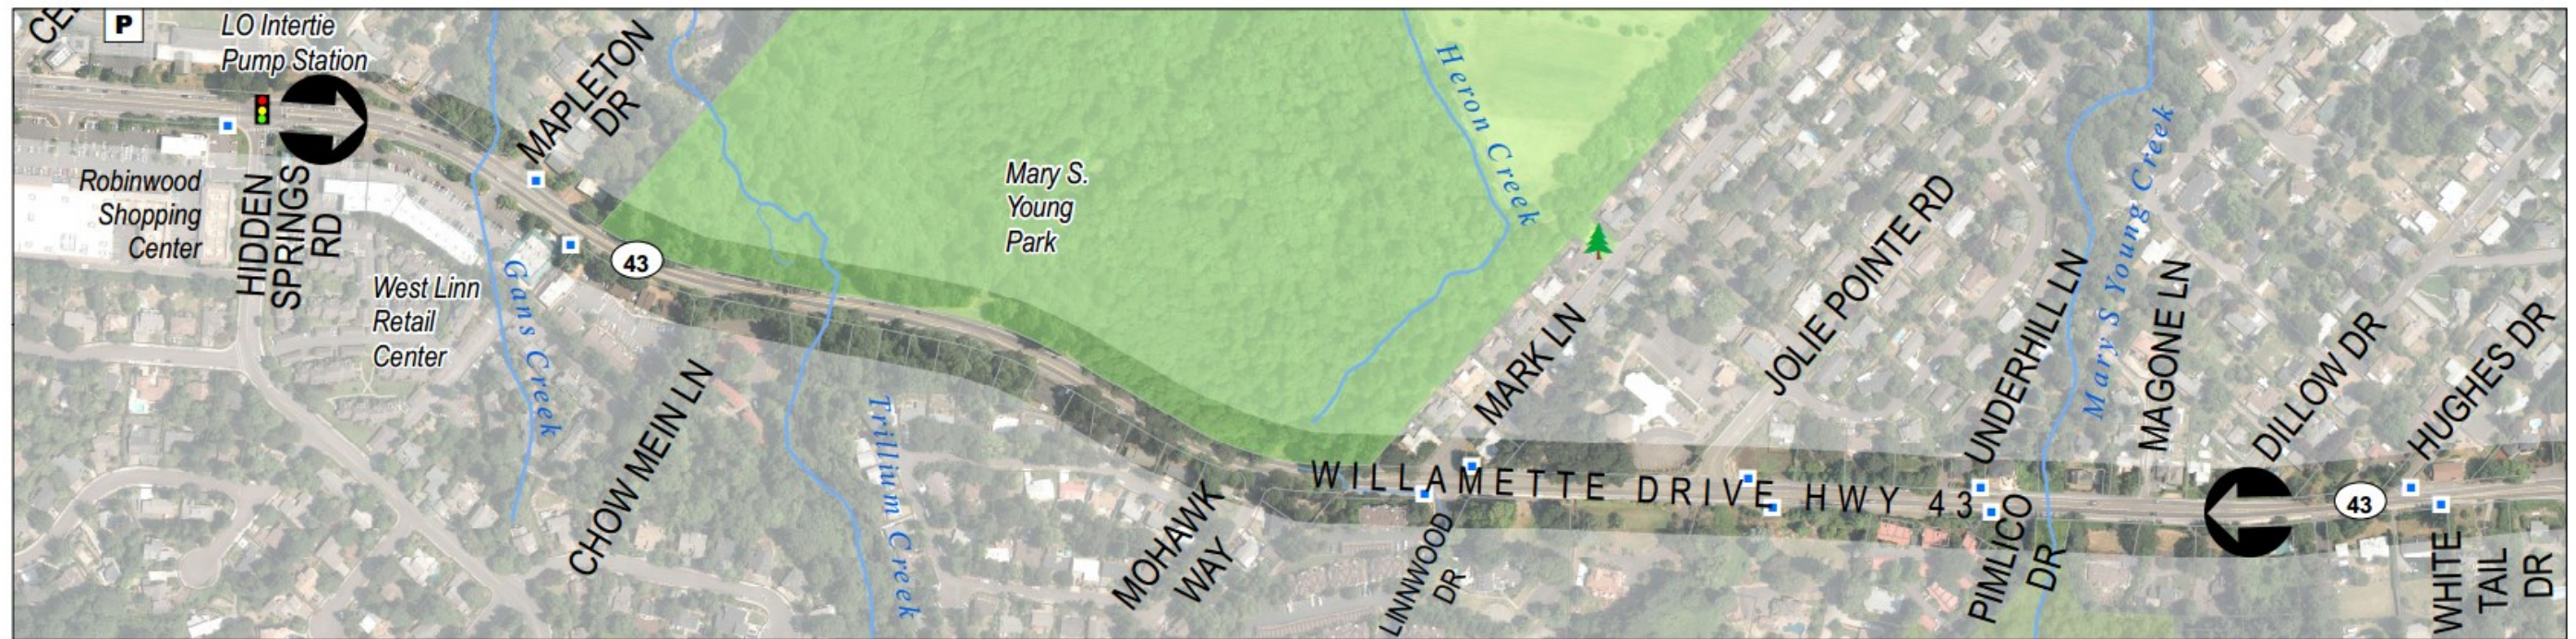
Segment B of 2016 Plan stretching from south of Hidden Springs Road to north of Dillow Drive
